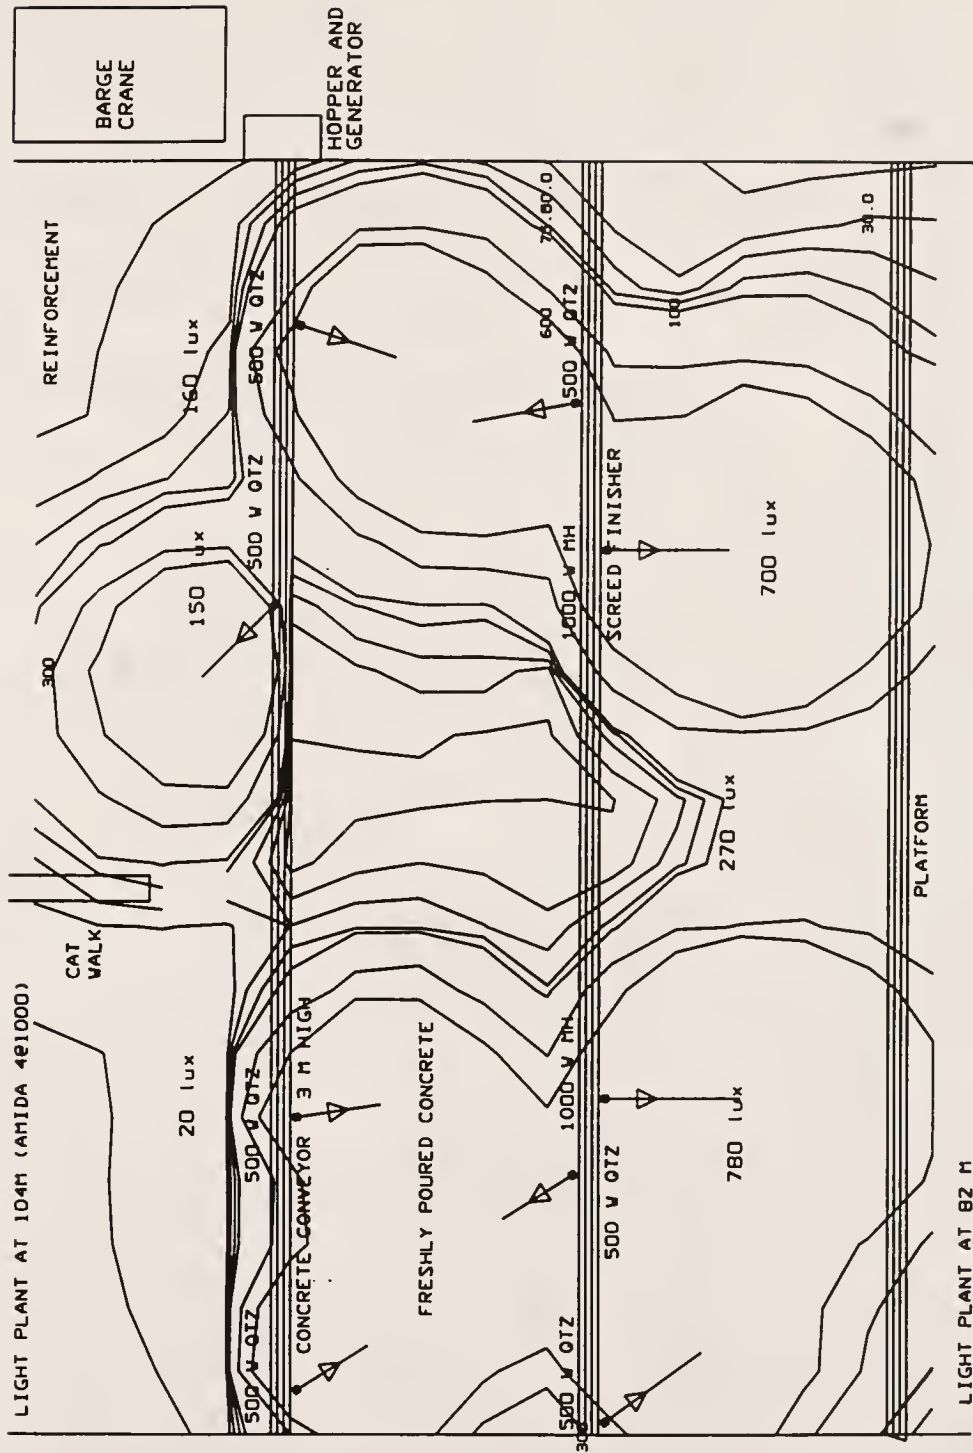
Plan Layout of Workzone (Case Study 3: Bridge Deck)
